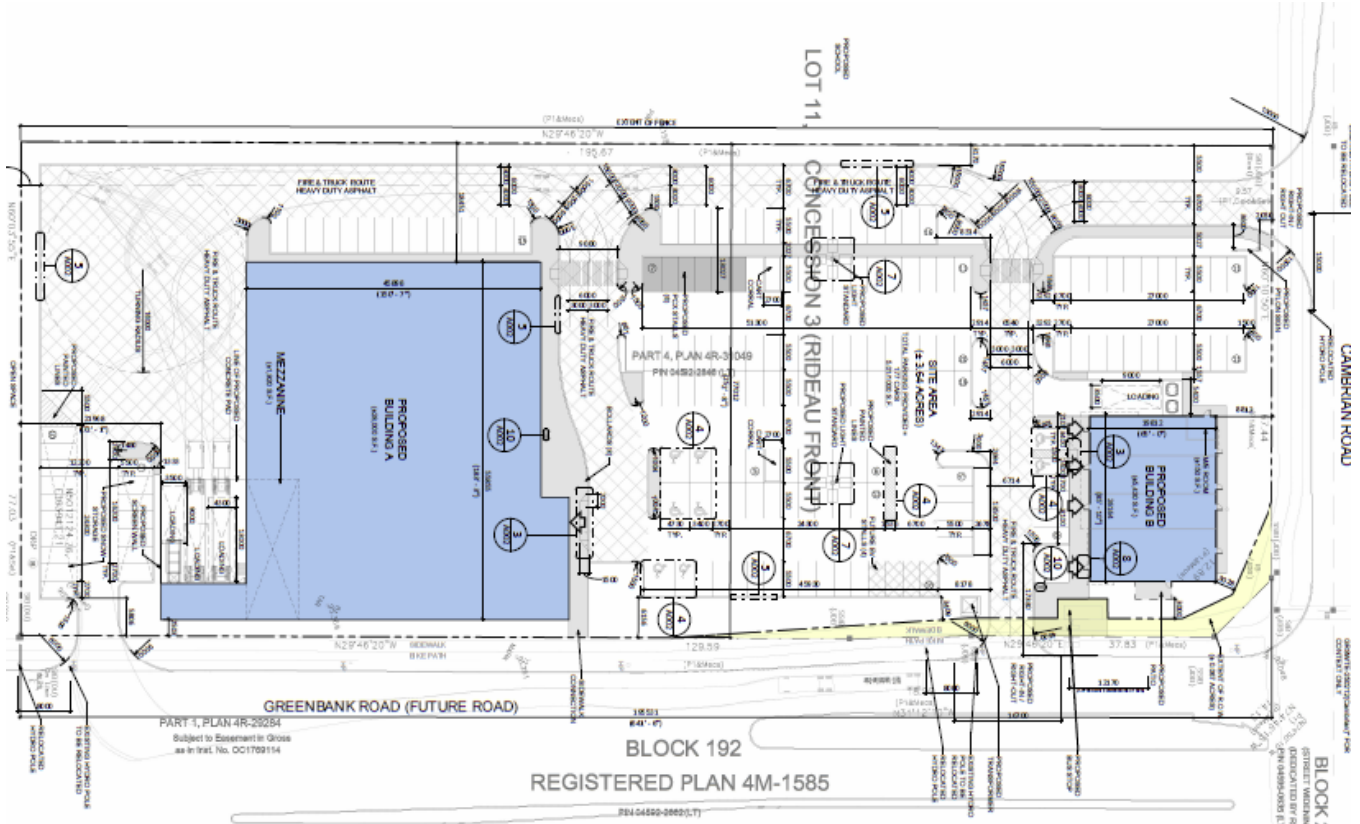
Proposed Ultimate Site Plan depicting the full build-out of part of the subject property, including the proposed access from Future Greenbank Road.
